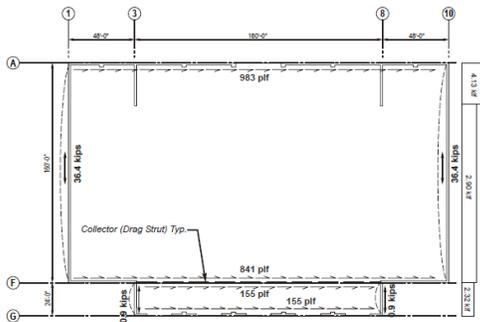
(a) Diaphragm Shear and Chord Forces for Earthquake Loads in the East-West Direction
